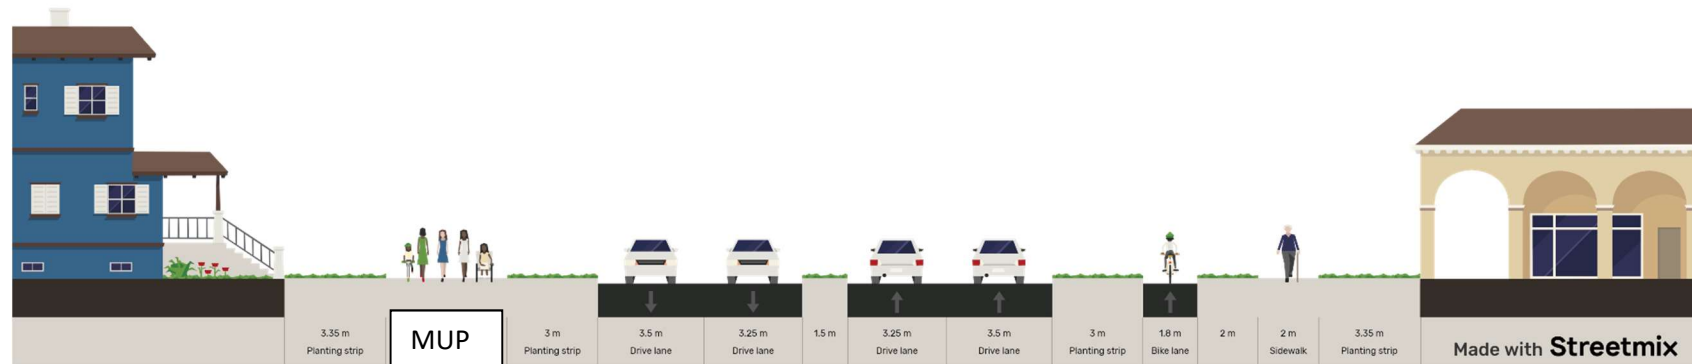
Cross-Section of Street 1 – East of Street 9 /11
